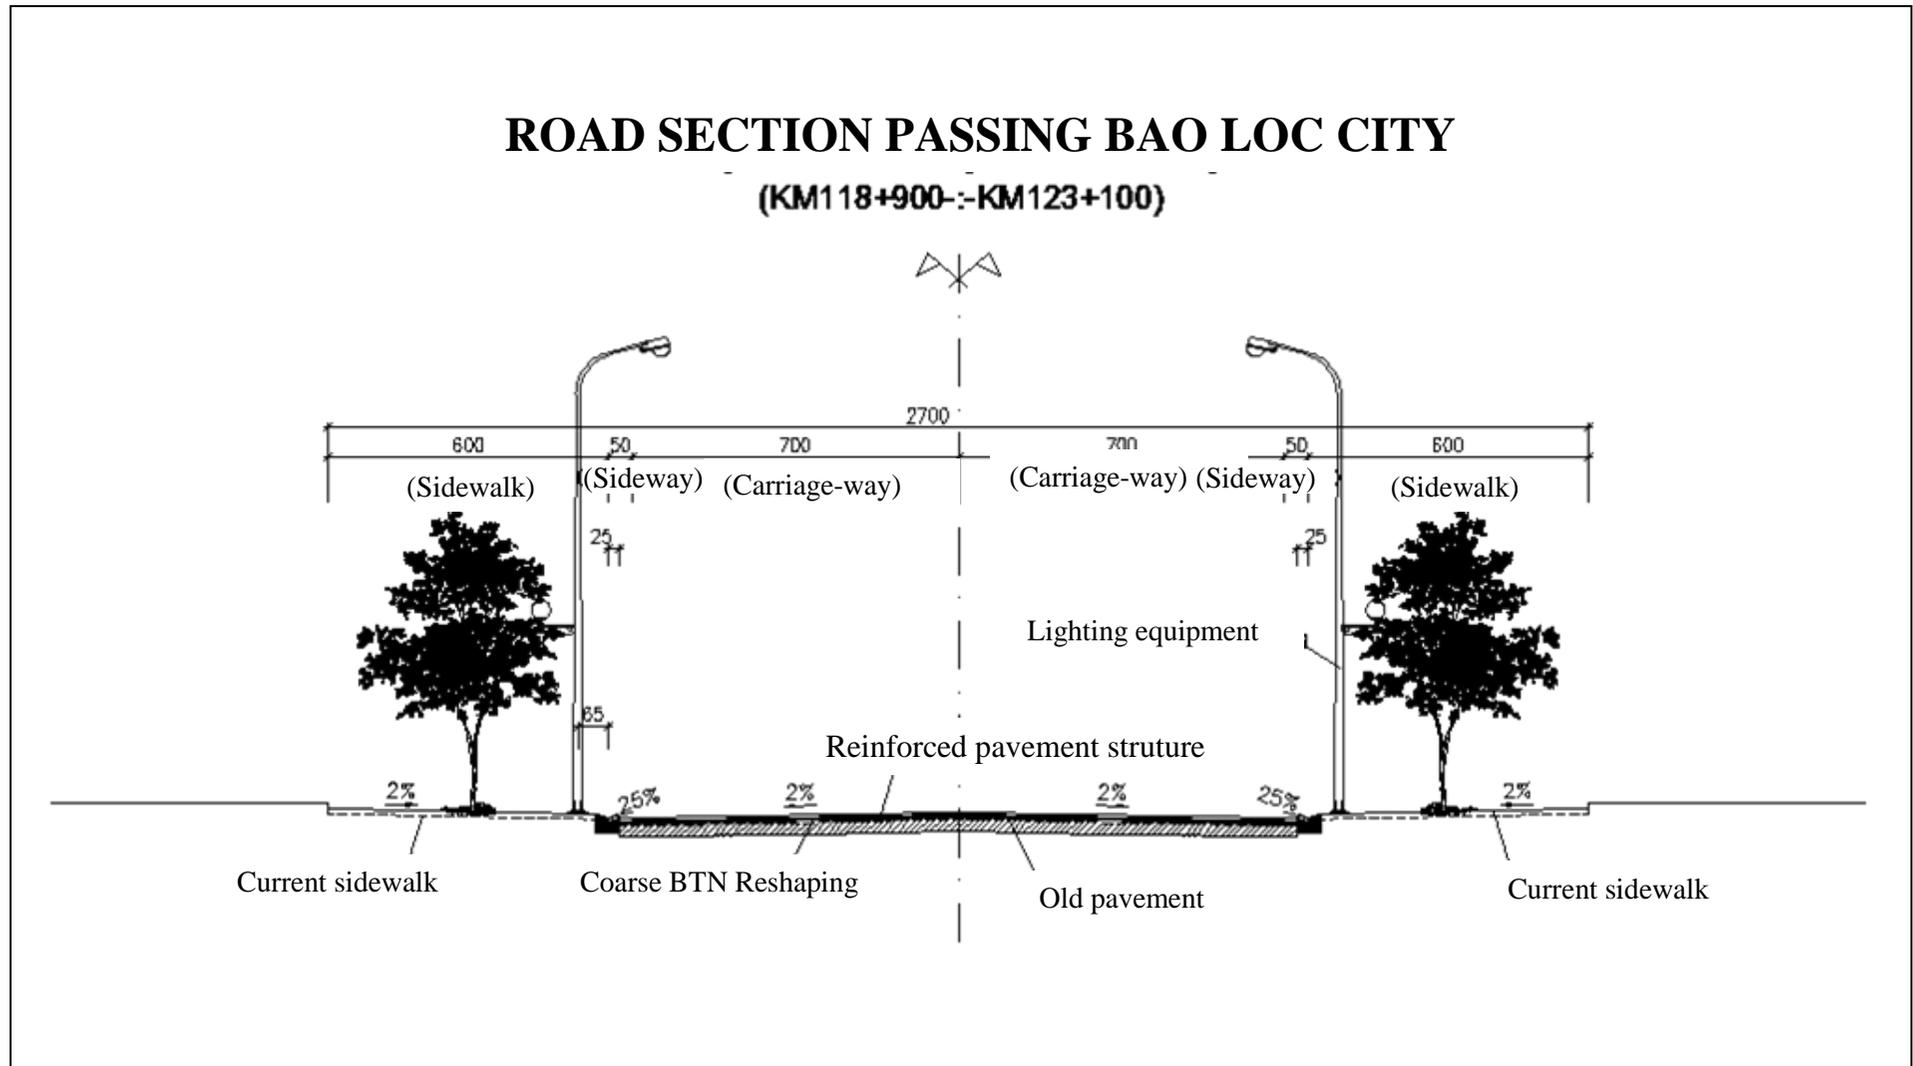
Typical cross section of road section passing Bao Loc City
